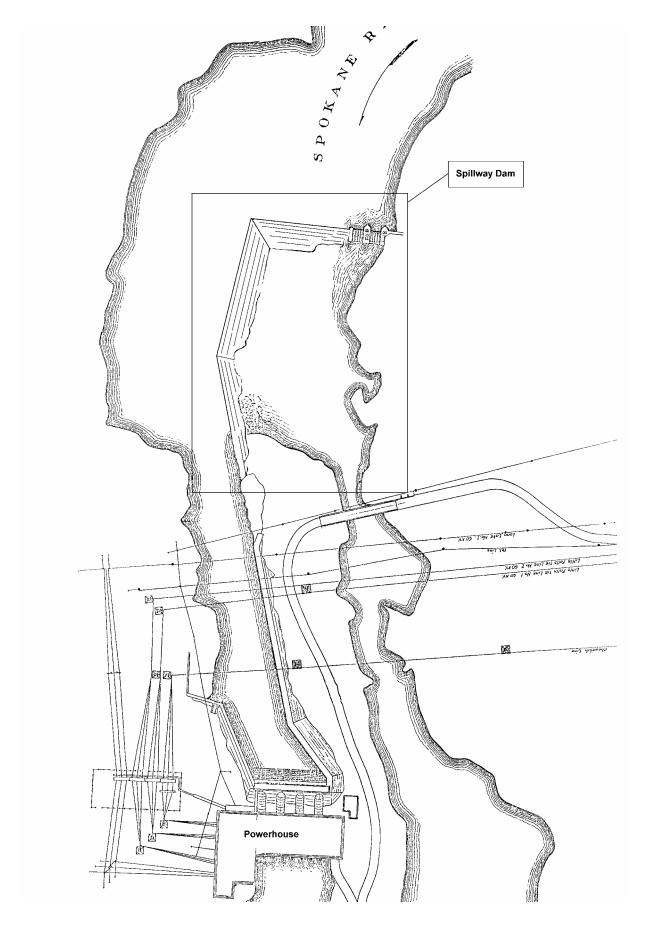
Little Falls Forebay & Spillway Dams, Site Layout
